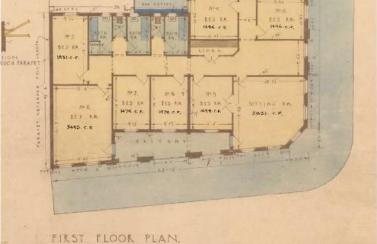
Architects Copeman and Lemont's first floor plan of the new (and existing) Ashfield Hotel prepared in 1926 for Tooth & Co Ltd
